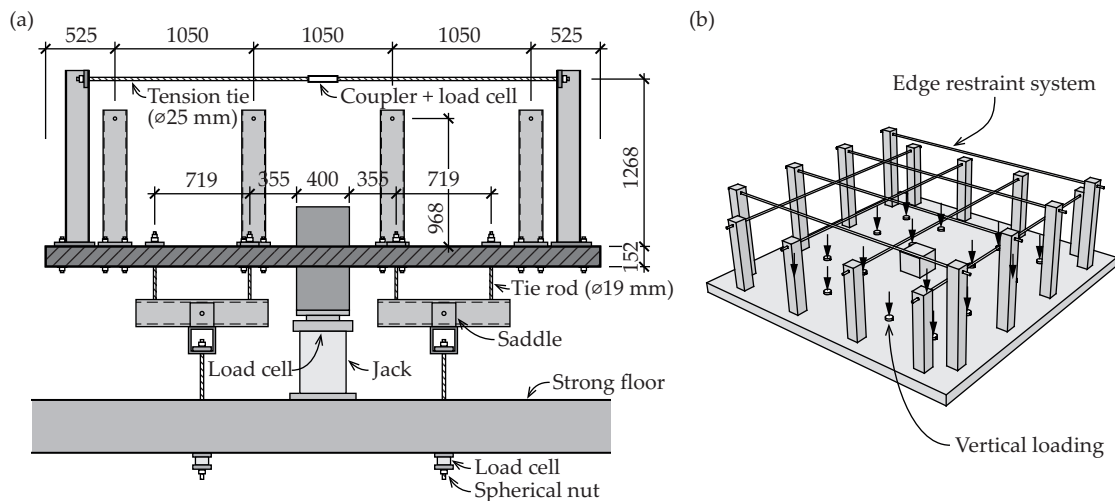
Test setup: (a) section cut; (b) view of the test specimen and the edge restraint system (dimensions in mm)
